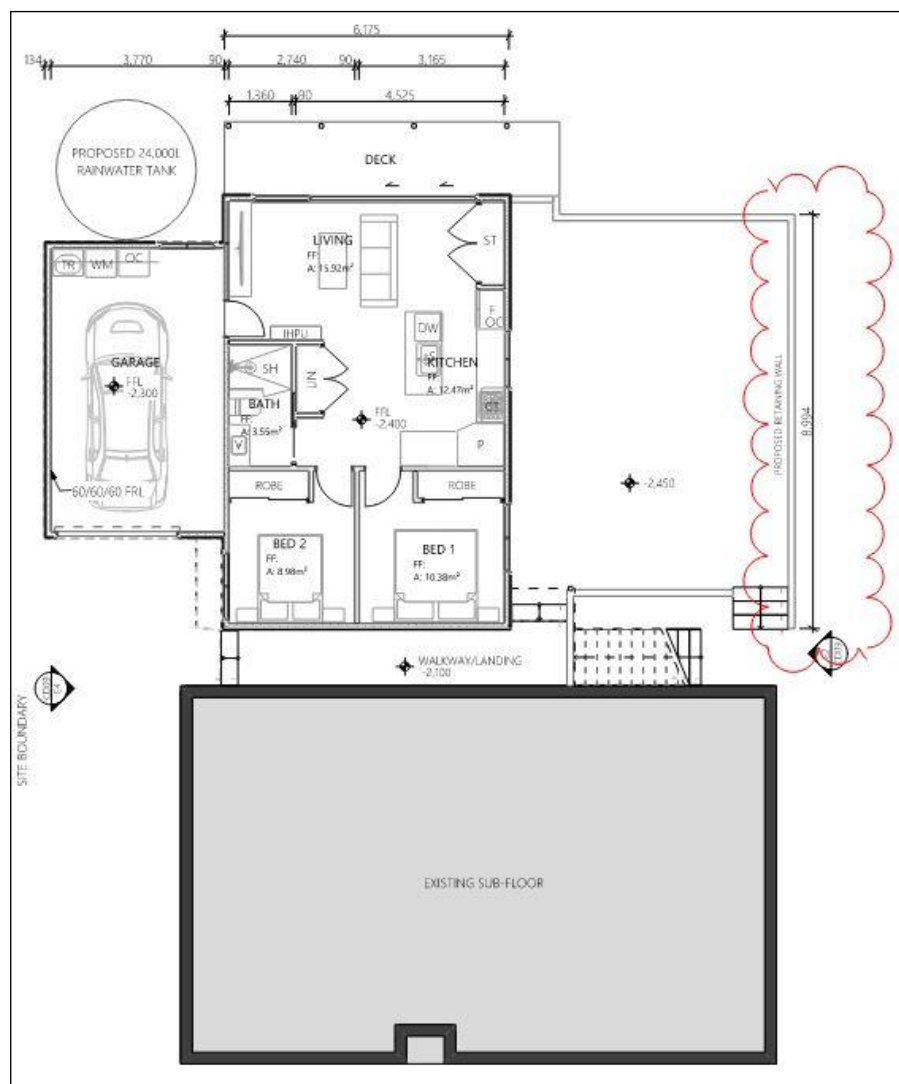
Ground floor plan showing the proposed extension, staircase, landing and deck.
